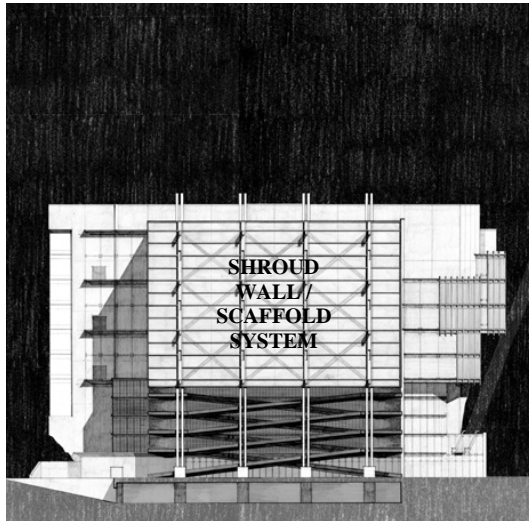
Front Elevation: D&T Zone Elevation showing shroud wall and exterior columns.
